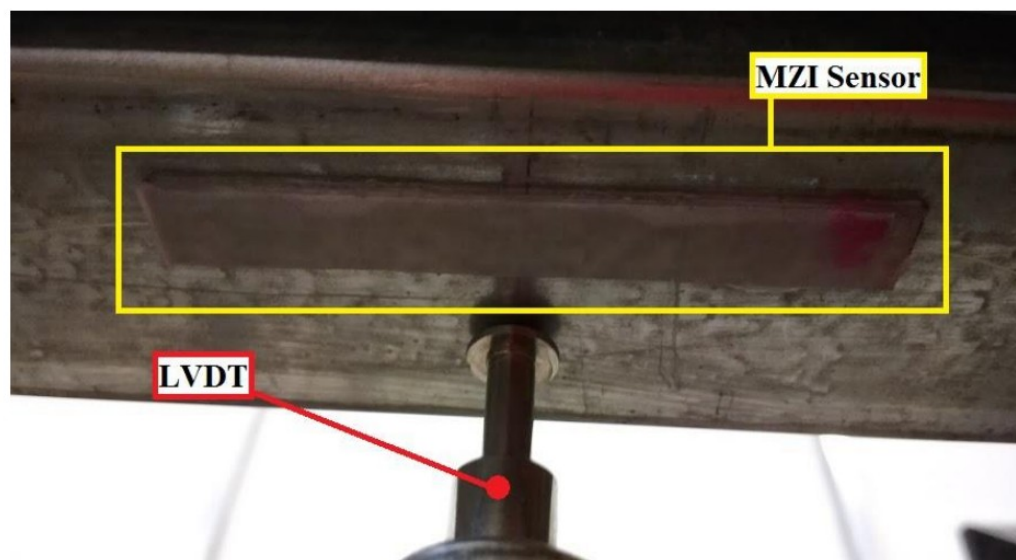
The installation of MZI sensor and LVDT under the bottom chord.
